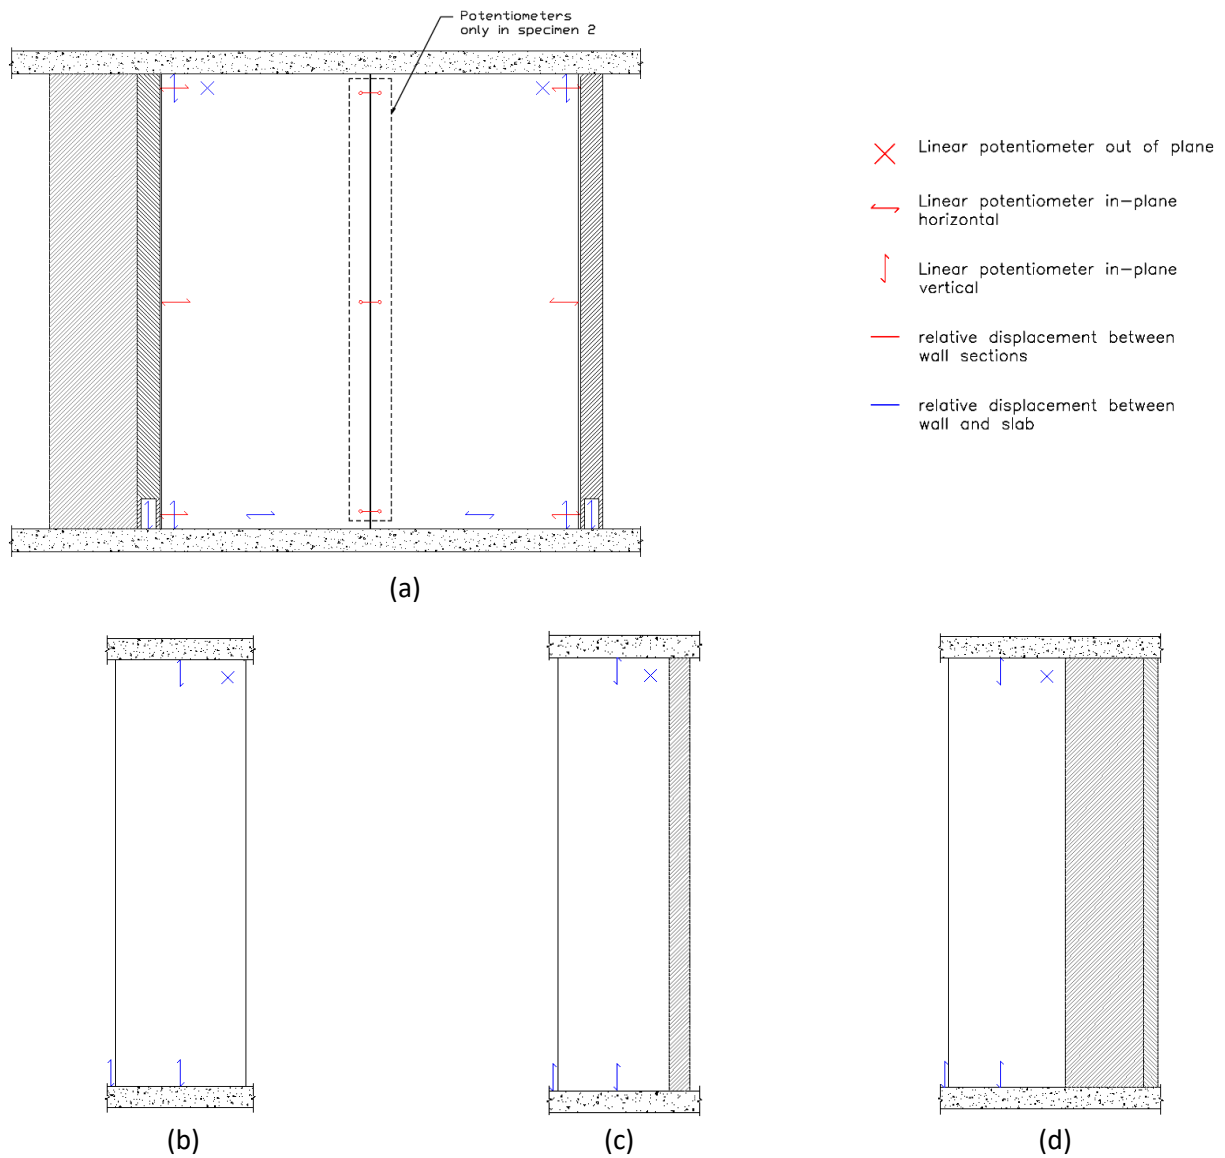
Potentiometer layout (a) primary wall north face (b) west return wall west face (c) north east return wall west face (d) south east return wall east face.
